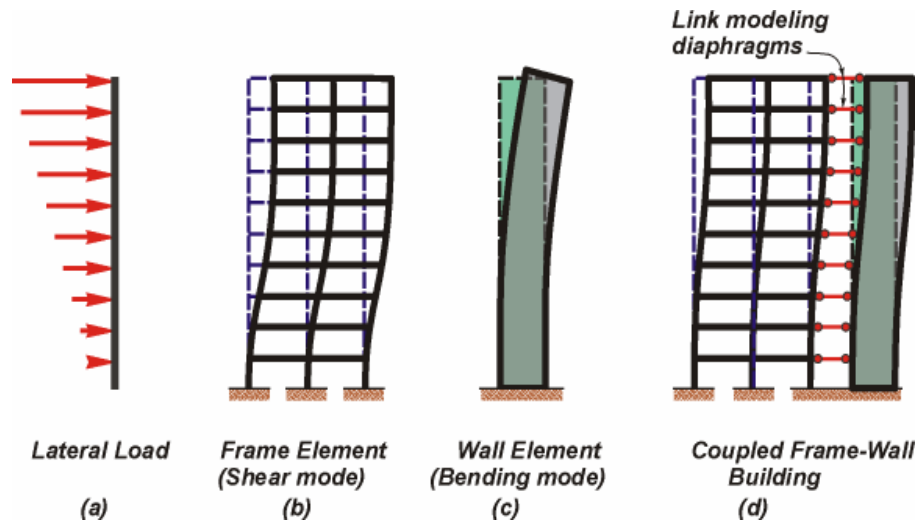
Deformation patterns for frame and wall elements (Paulay and Priestley, 1992)
